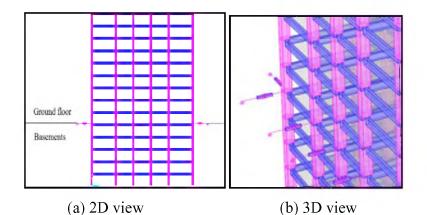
(a) 2D view and (b) 3D view of horizontal dampers modeling at ground floor level
